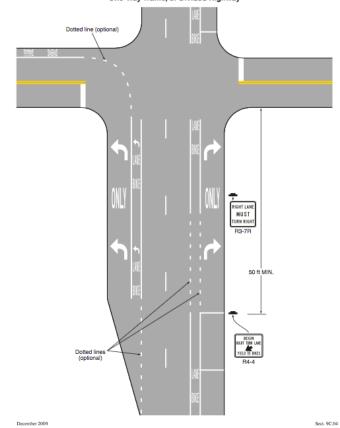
C-1. Example of Intersection Pavement Markings—Designated Bicycle Lane with Left-Turn Area, Heavy Turn Volumes, Parking, One-Way Traffic, or Divided Highway
